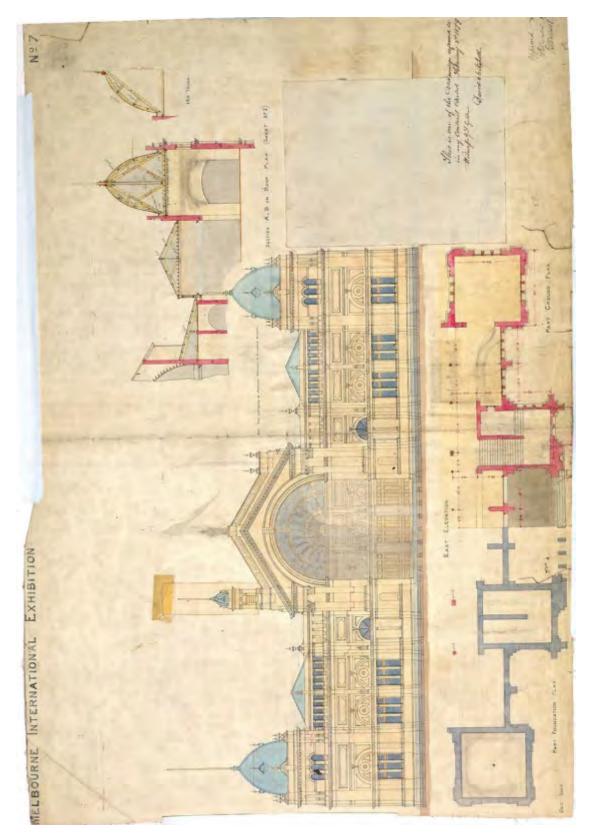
The Melbourne International Exhibition, east elevation, part foundation, part ground plan, & section A—B roof plan, 1879 Source: Bates Smart & McCutcheon archives
